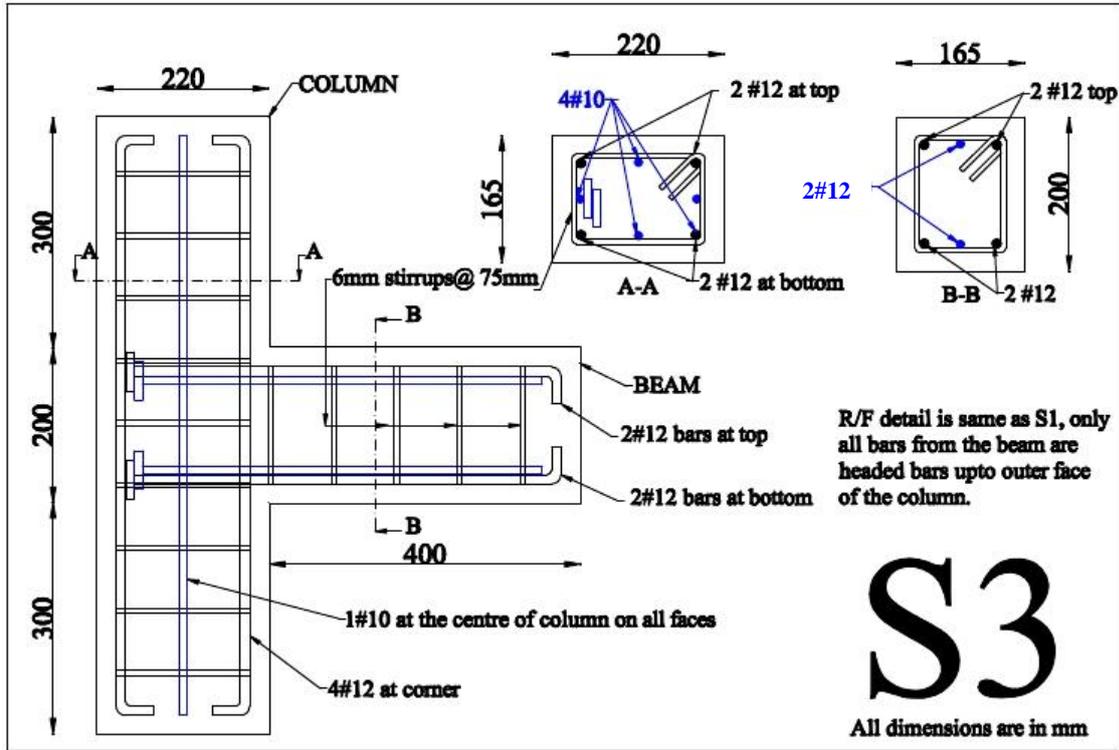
Reinforcement arrangement with headed bars (Head Plates in parallel planes)
